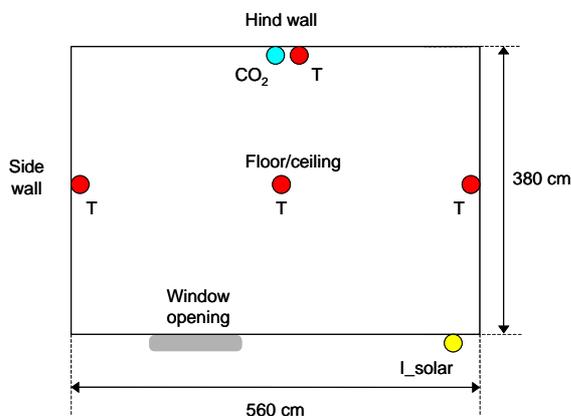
Floor plan of a room with the location of sensors. Sensors on the hind wall and side walls are placed at a height of 1.5m.
